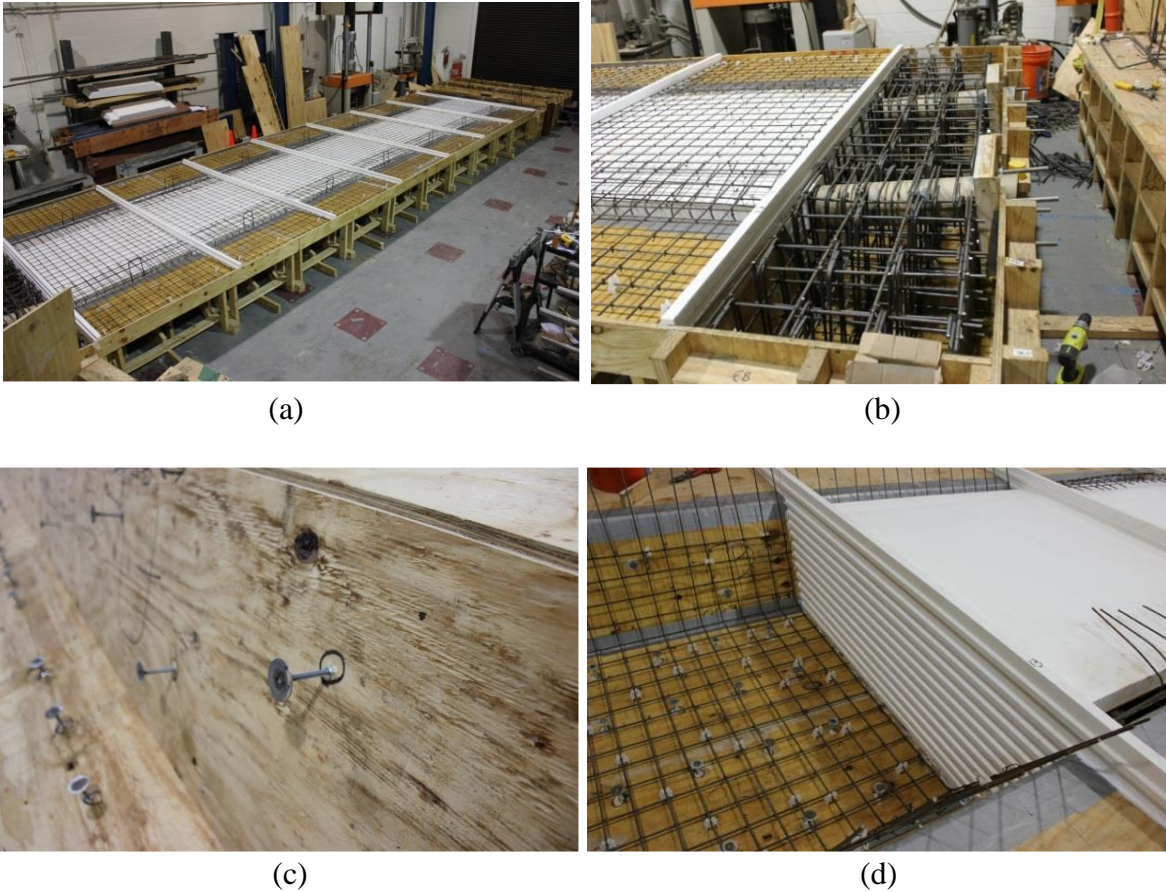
Formwork for Segmental Bridge Model: (a) Full View, (b) Anchorage Block Details, (c) Spacer, and (d) Styrofoam
